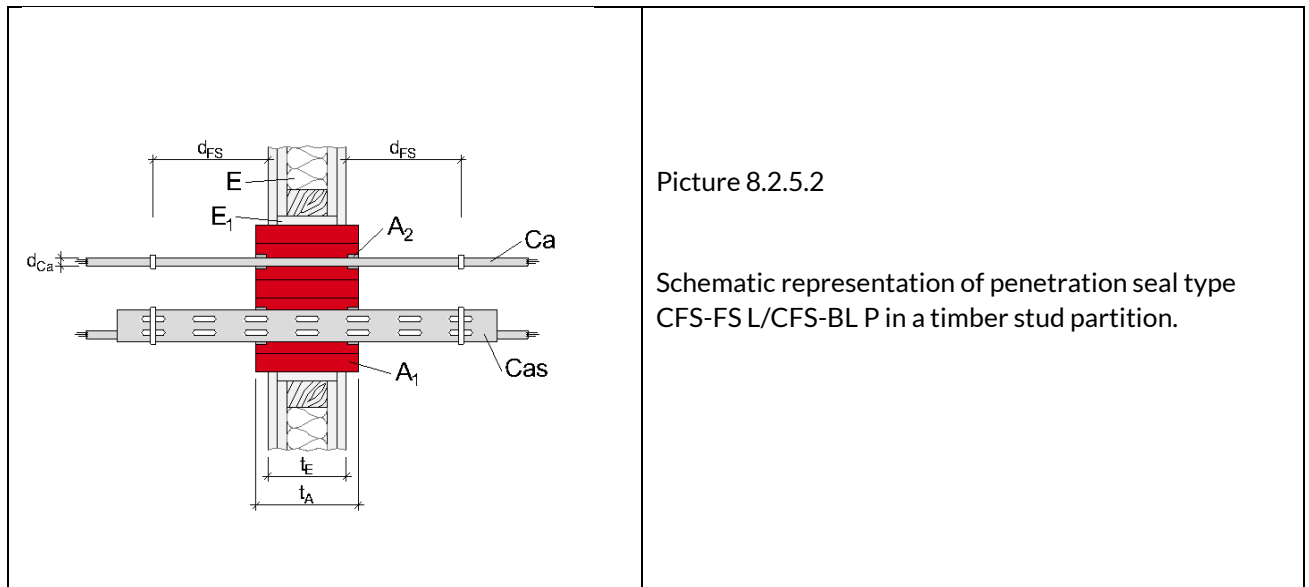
cable penetration applications through CFS-FS L or CFS-BL P seal trough a timber stud partition wall construction
